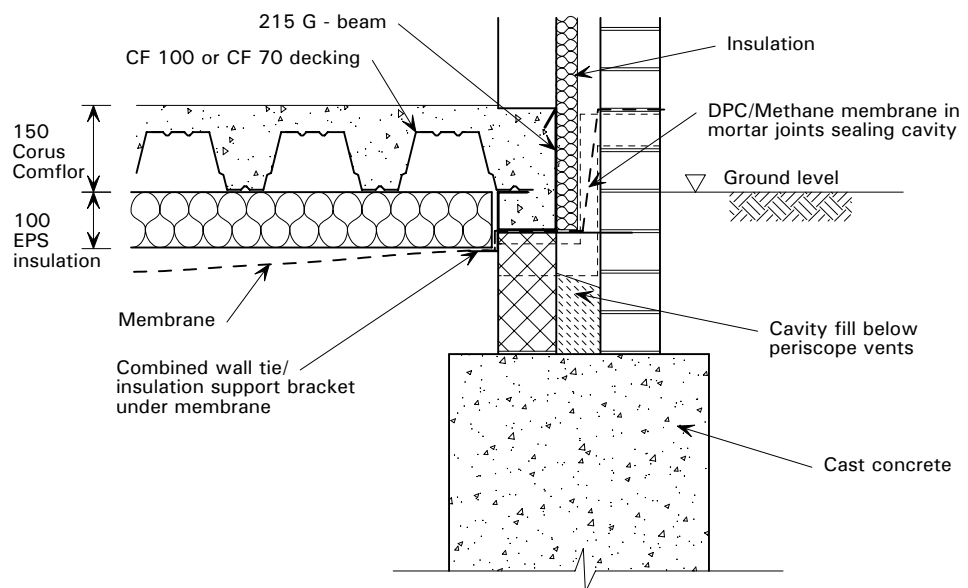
Suspended composite ground-floor system on blockwork and trenchfill foundation
